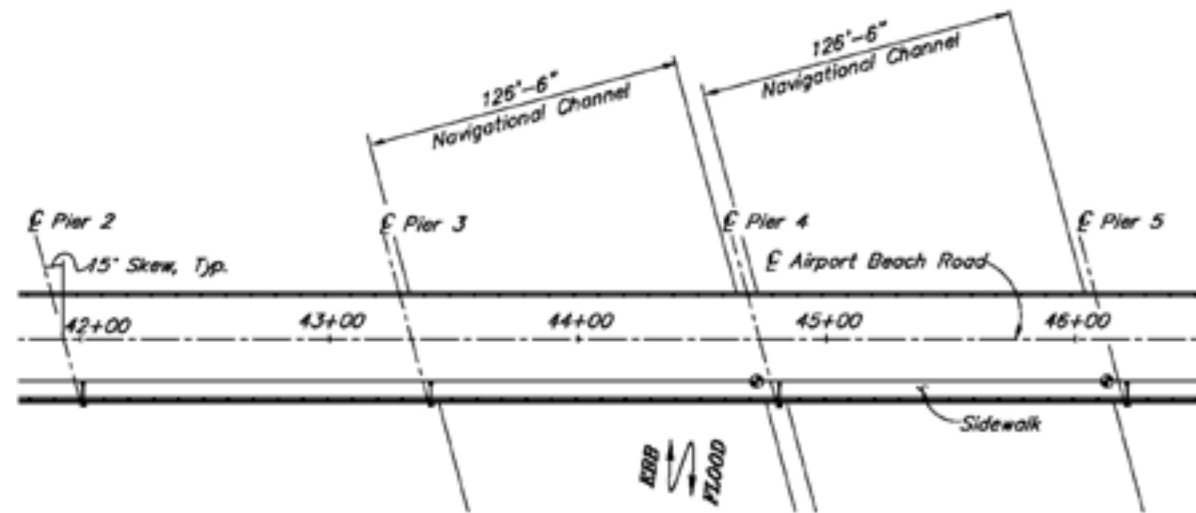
Bridge plan view indicating multiple navigation channel width dimensions to substructure units in the waterway. (Source: Alaska DOT)
